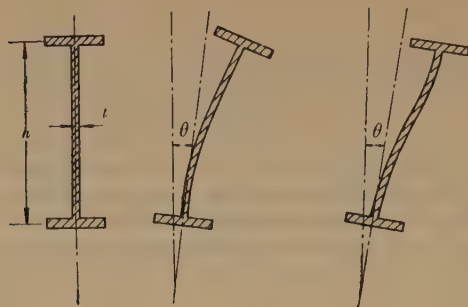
TYPICAL DISTORTIONS OF SLENDER UNSTIFFENED WEBS
